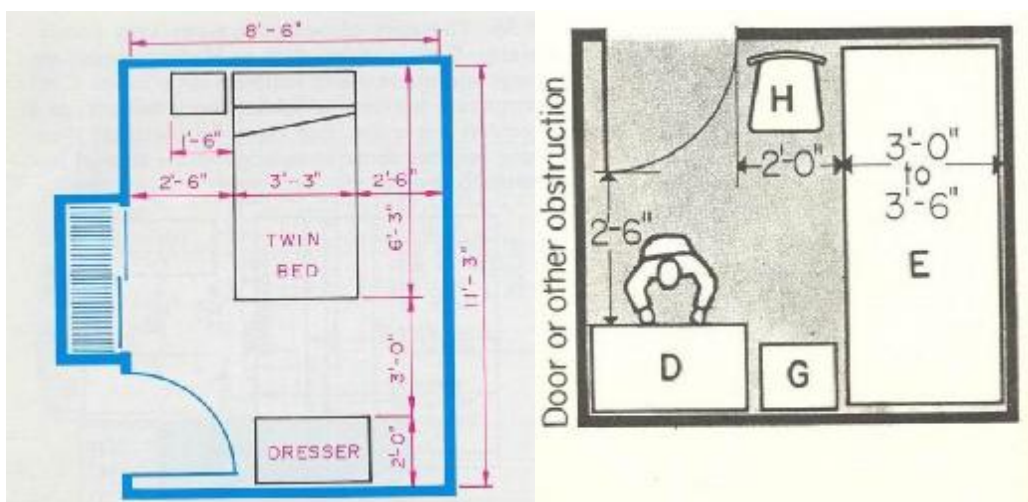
shows the minimum bedroom spacing for a single occupancy with one twin bed.
